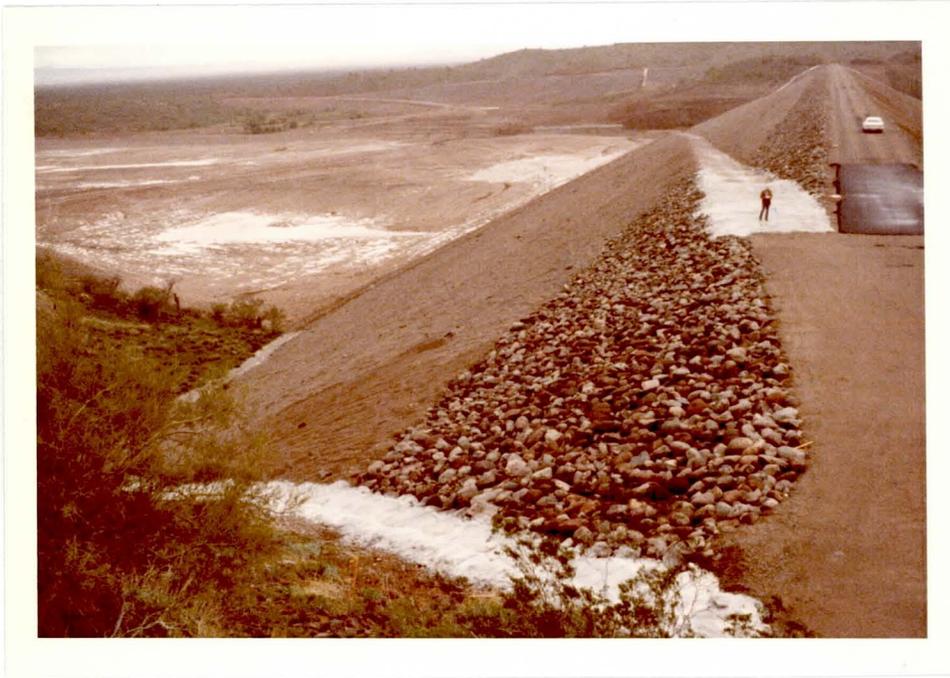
Upstream face, view east along access road to outlet works, taken from the right abutment.
